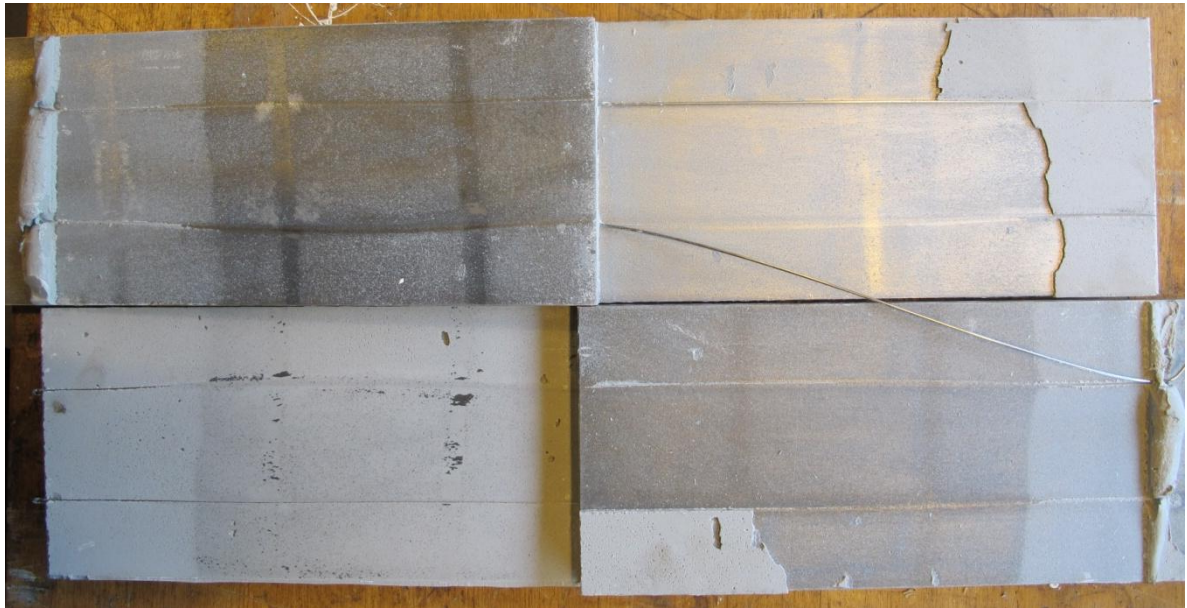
Connection 5 – complete delamination at first adhesive layer in Z-shape
